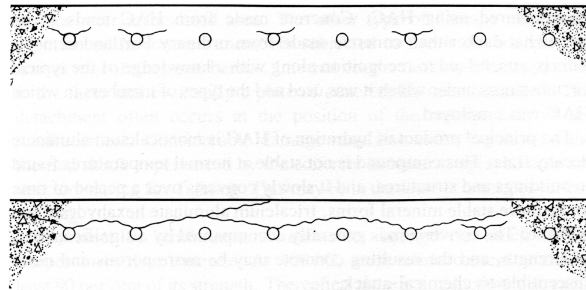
Hypothetical Delaminations through reinforced concrete cross-section due to expansion during reinforcement corrosion
